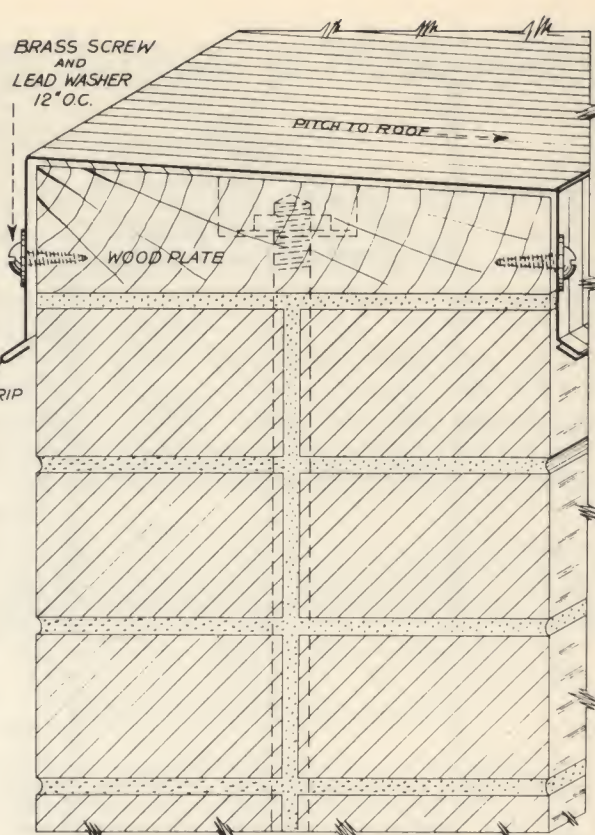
SHEET METAL COPING — ALTERNATE METHOD
